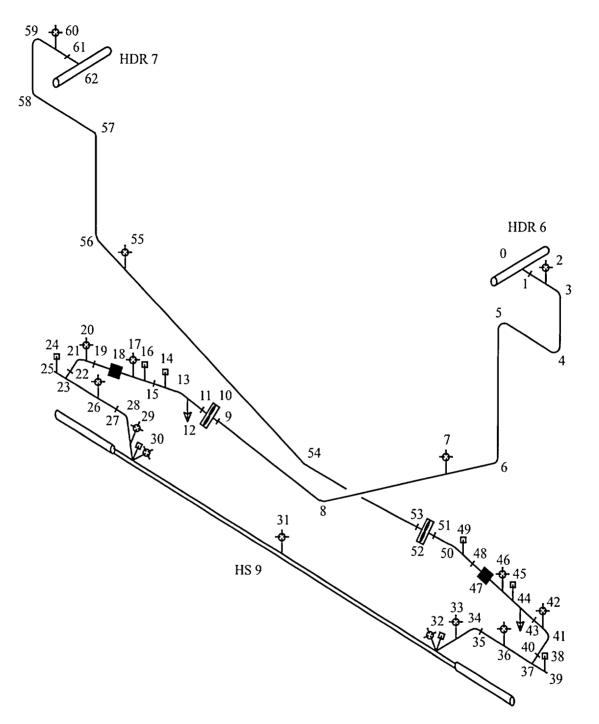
Elevation Diagram for Heated Section HS9 Feeders
